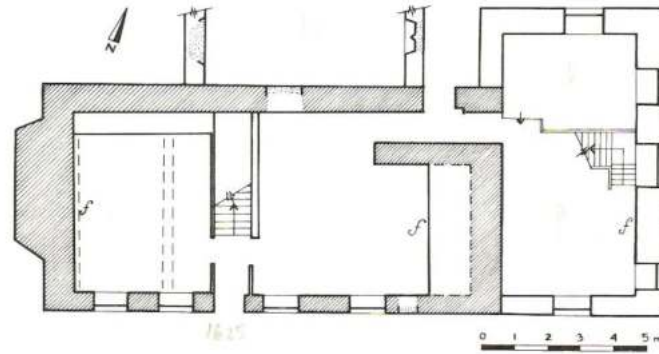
Dent, High Hall [543]. Large 1625 farmhouse with rubble walling; one huge external stack and one internal, both fireplaces concealed inside. Extended by parlour and dairy added at one end, and by rear kitchen wing with another stone-arched fireplace 4m across occupying whole gable end, probably built 1665.
